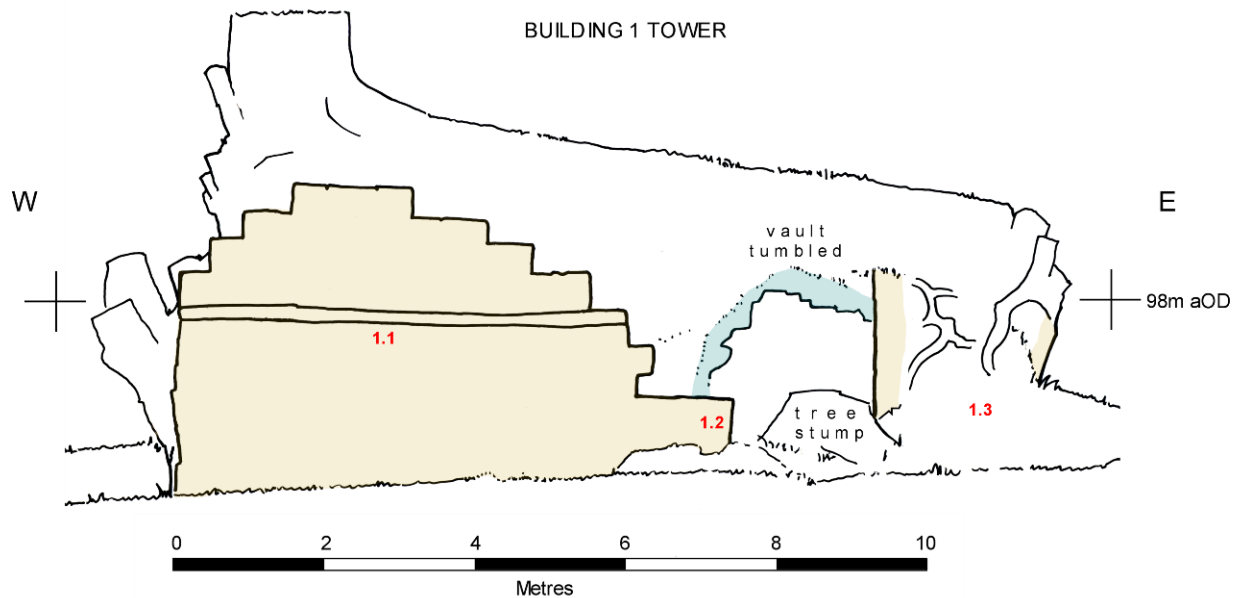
South elevation of the Tower House. Surviving facing stones in buff tone. Edge of tumbled vault in blue tone (1:100)
